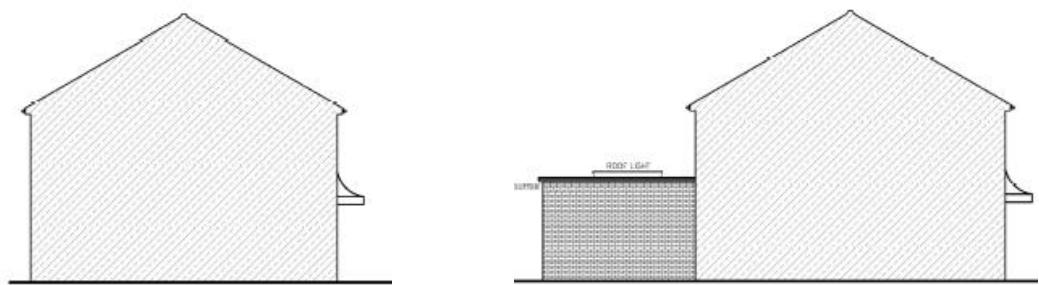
Existing side elevation (left) and Proposed side elevation (right).
